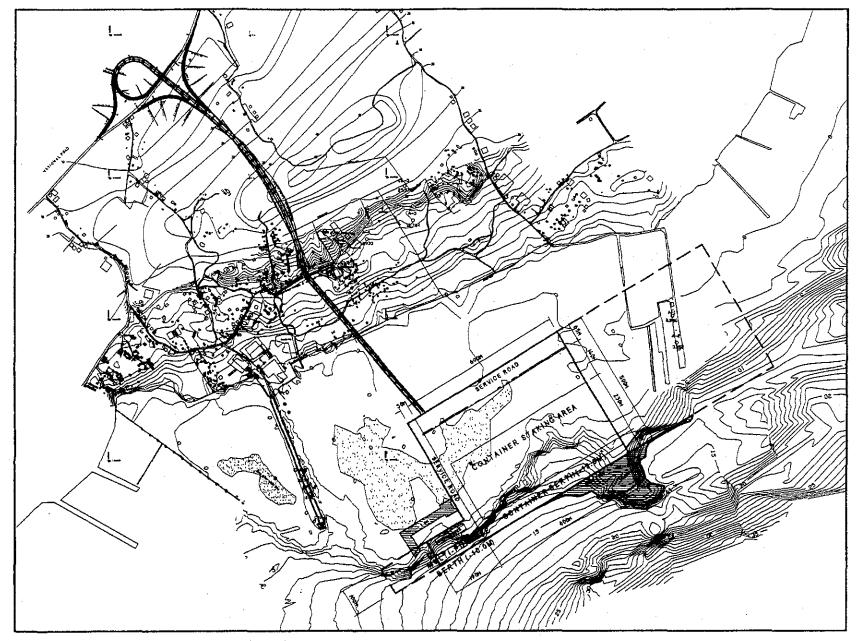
Short-term Development Plan of New Cebu Port (1)
